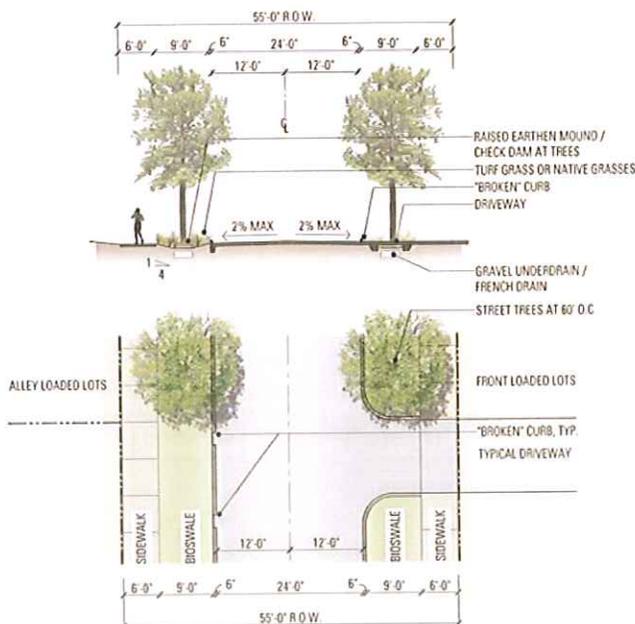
Typical Street Section 55' ROW, with 6' Sidewalks
